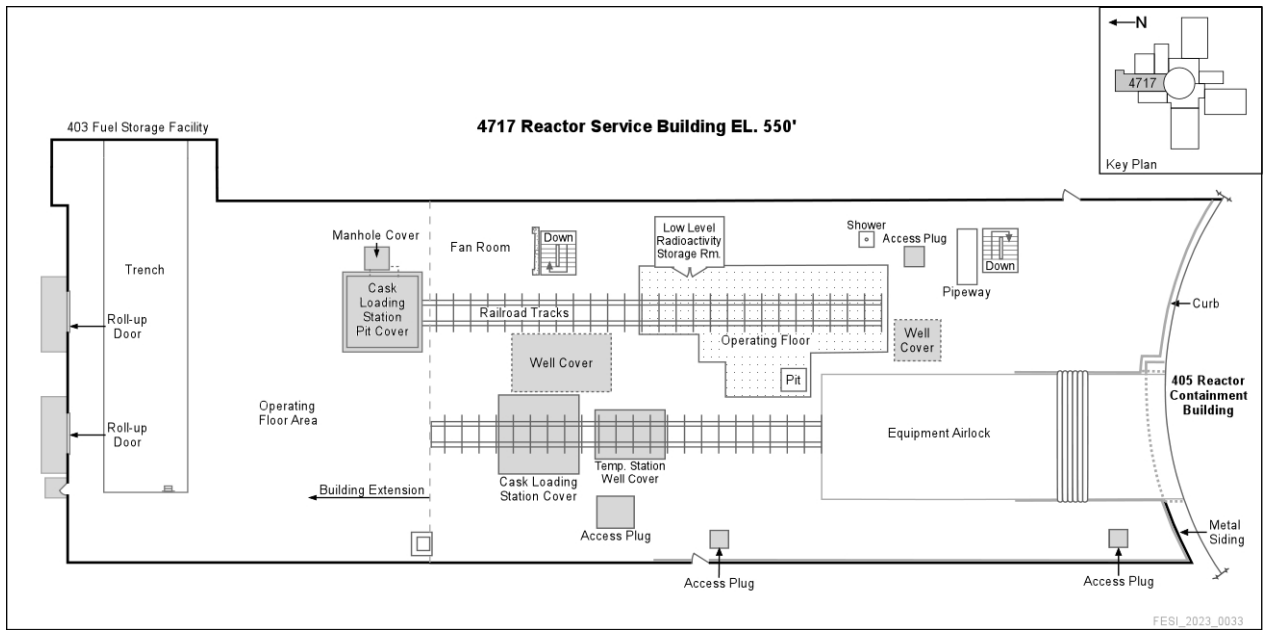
Plan View of 4717 Reactor Service Building (550 ft Elevation)
